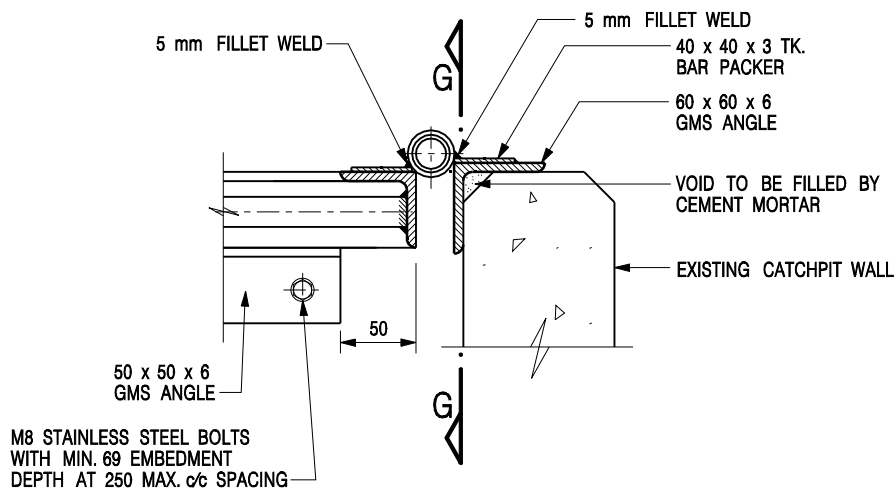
### DETAIL 'G' - DETAILS OF STEEL GRATING CONSTRUCTED ON EXISTING CATCHPIT
